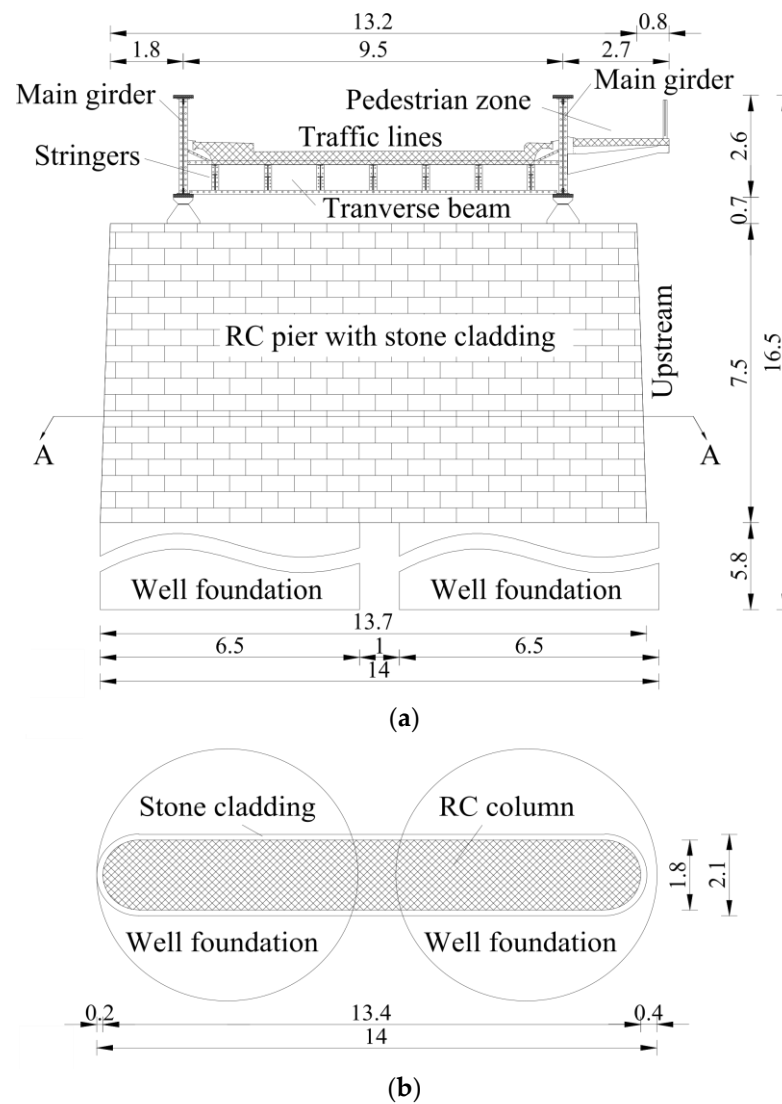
(a) Cross-section of the case-study bridge; (b) cross-section A-A at the base of the pier.
